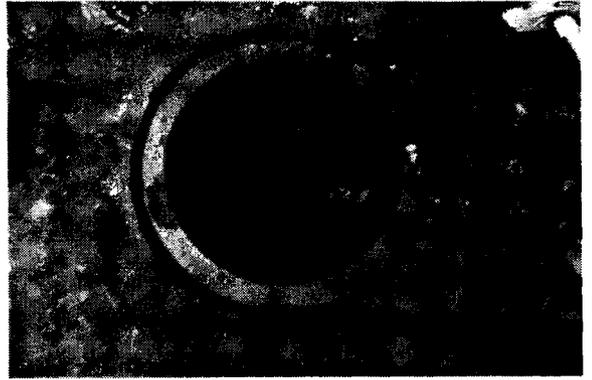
Shear stress failure shown on the portion of test core remaining in the drill hole.
